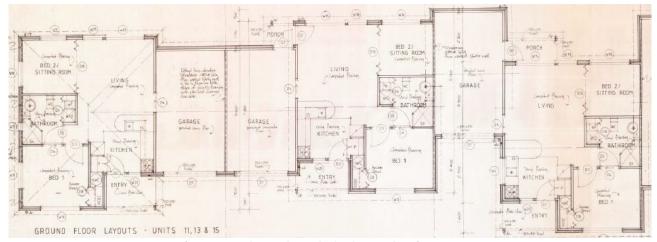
Floor Plan of Block M-of Units 11,13,15.
